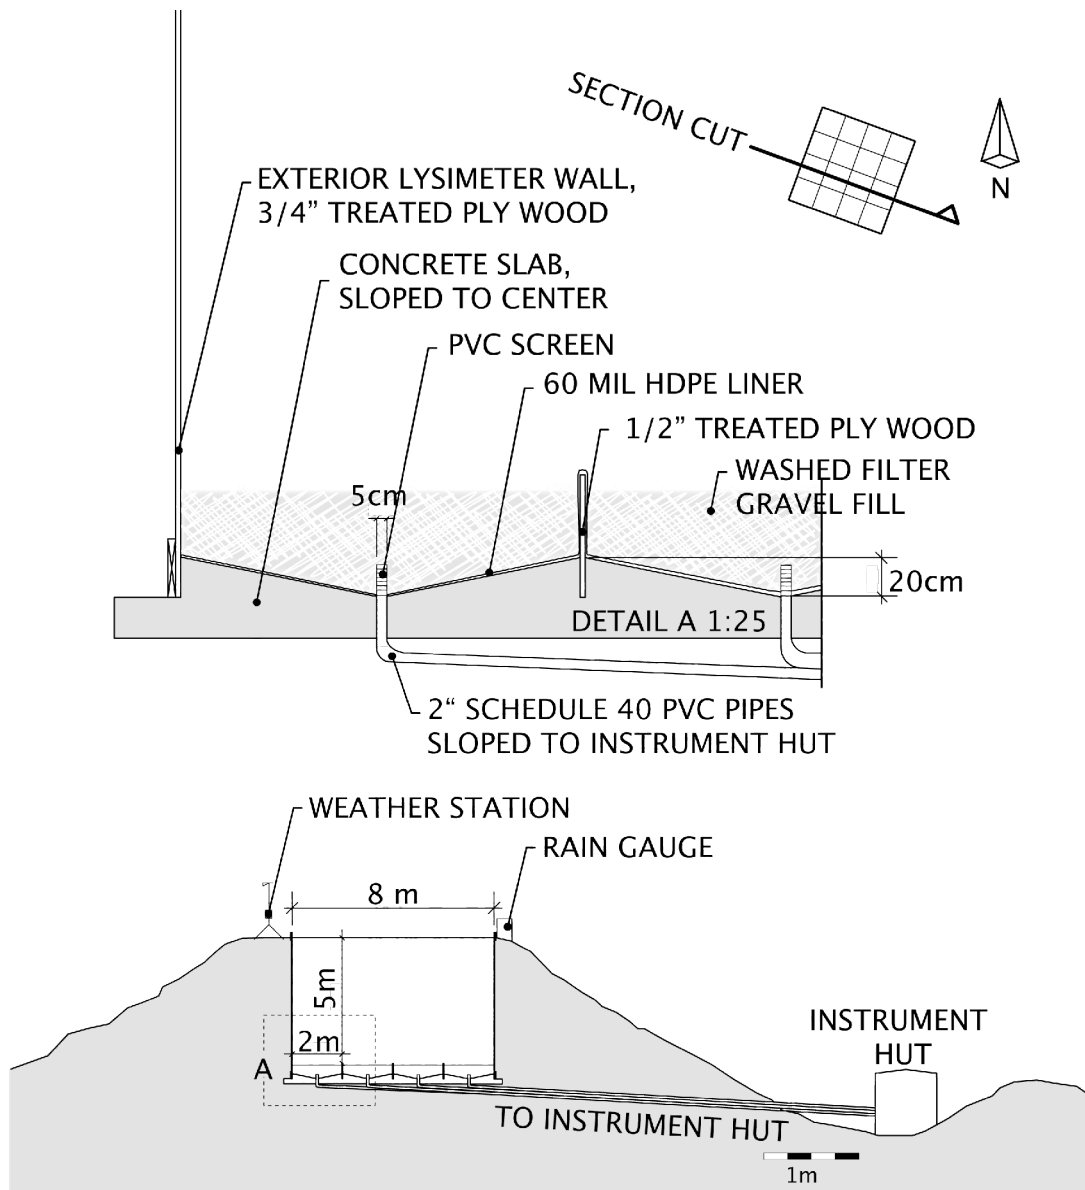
Cross-section of the constructed waste rock pile and a detail of the basal lysimeter design.
